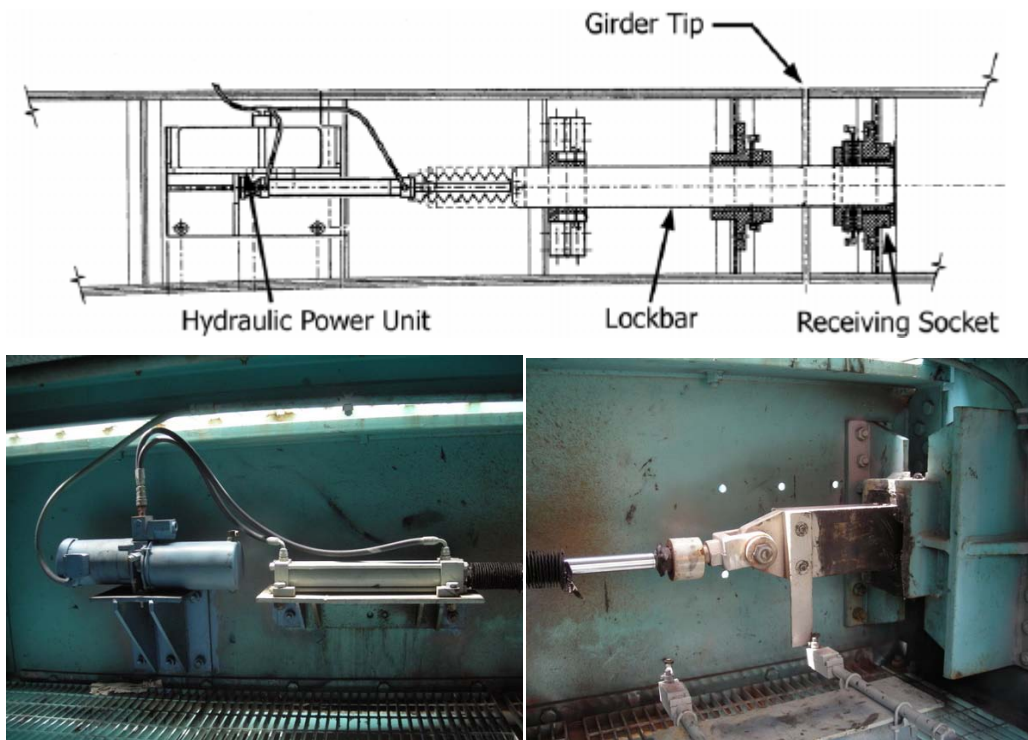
Span Lock Components (sketch adapted from Christa McAuliffe Bridge construction plans)
